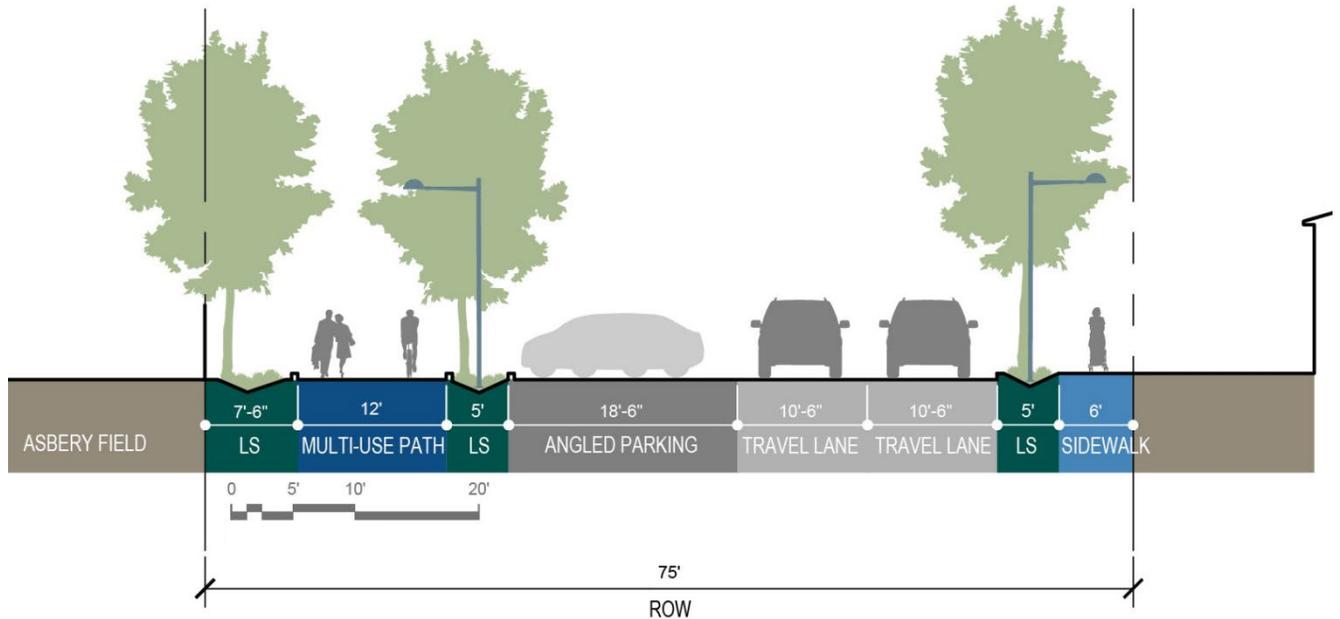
Proposed cross-section E – Quinn Ave from 4th St to 8th St (looking north)
